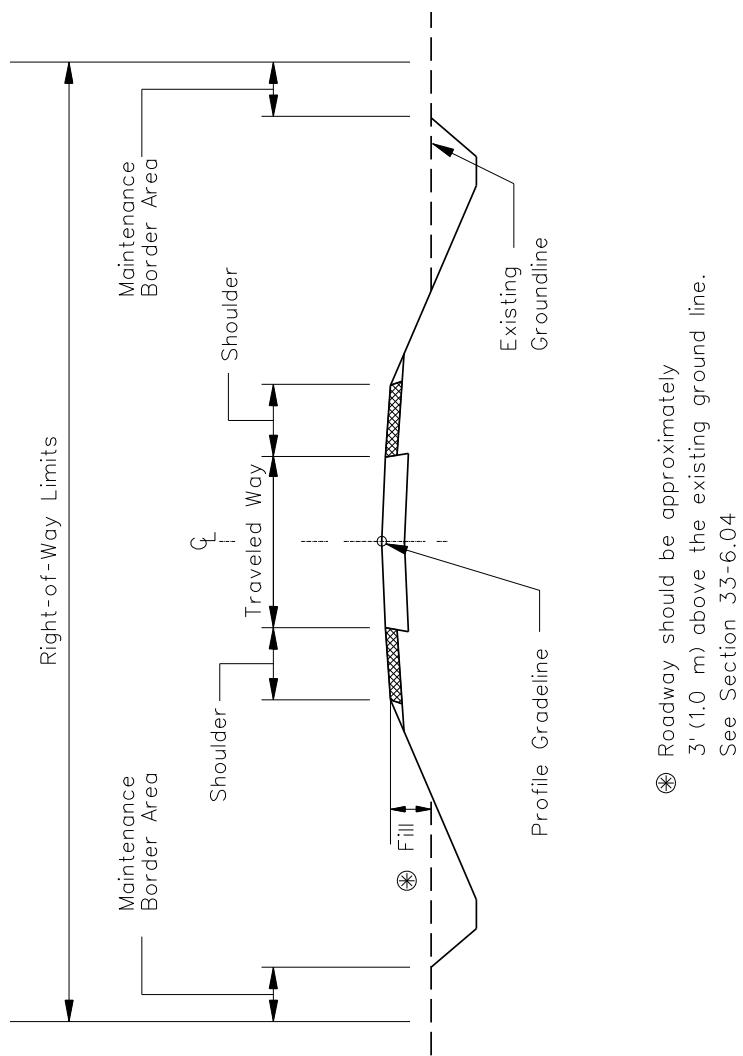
A and 47-2.B illustrate typical schematic cross sections for two-lane highways. The tables in Section 47-2.06 provide the minimum criteria for lane widths, shoulder widths, and other cross section elements that should be used on rural two-lane highways.
